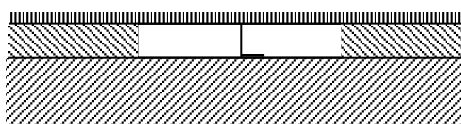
Flushfloor CTS/CDS – Installed flush with the upper level of the floor
